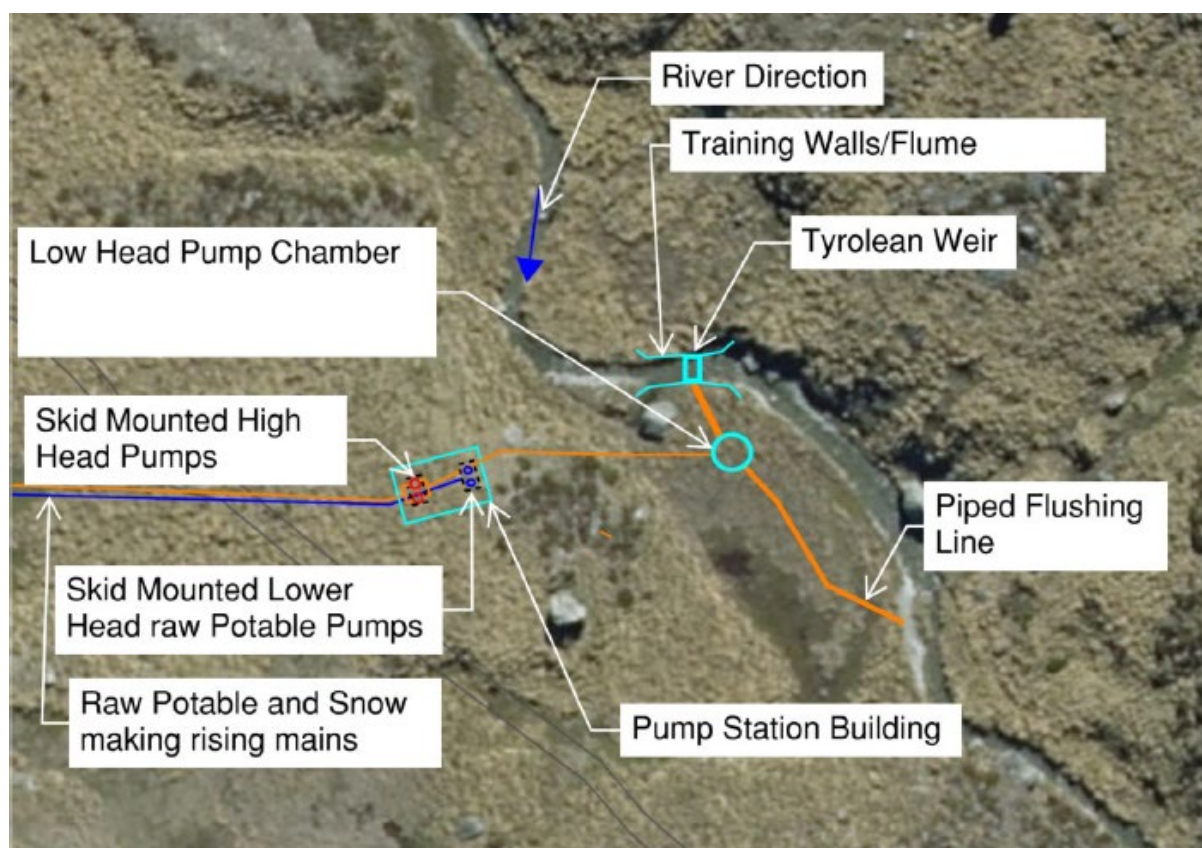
Proposed arrangement at intake site (Stantec New Zealand, 2025)
